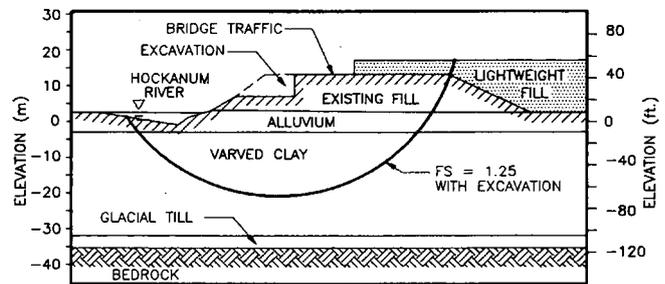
Slope stability for east abutment. Final conditions with lightweight fill.
